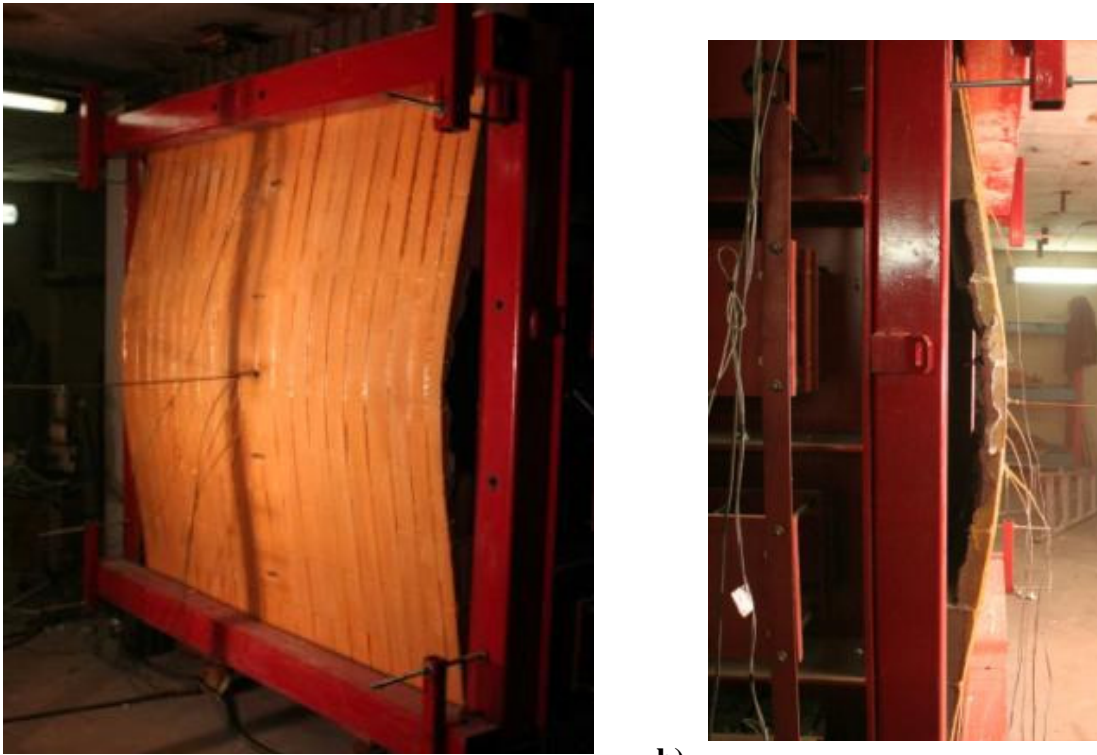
Retrofitted Load-Bearing Wall URM-4: a) After Shot 7; b) View of the Compression Face of Wall- Failure of Concrete Masonry Unit Block Face Shells in the Middle Two Courses after Shot 7
